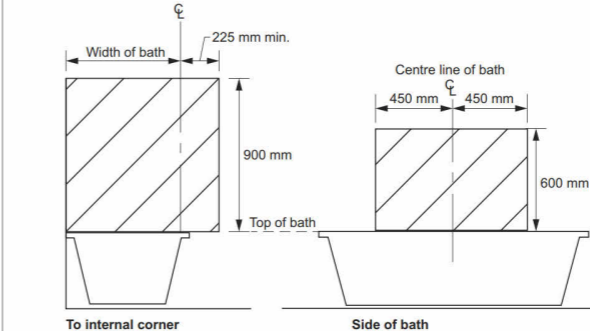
Taps, bath niches, soap holders and the like may be located within the positions designated for wall reinforcing. (2) Where the height of the bath tub is not yet known, an assumed height of 500 mm above finished floor level may be used to determine the location of wall reinforcing.
